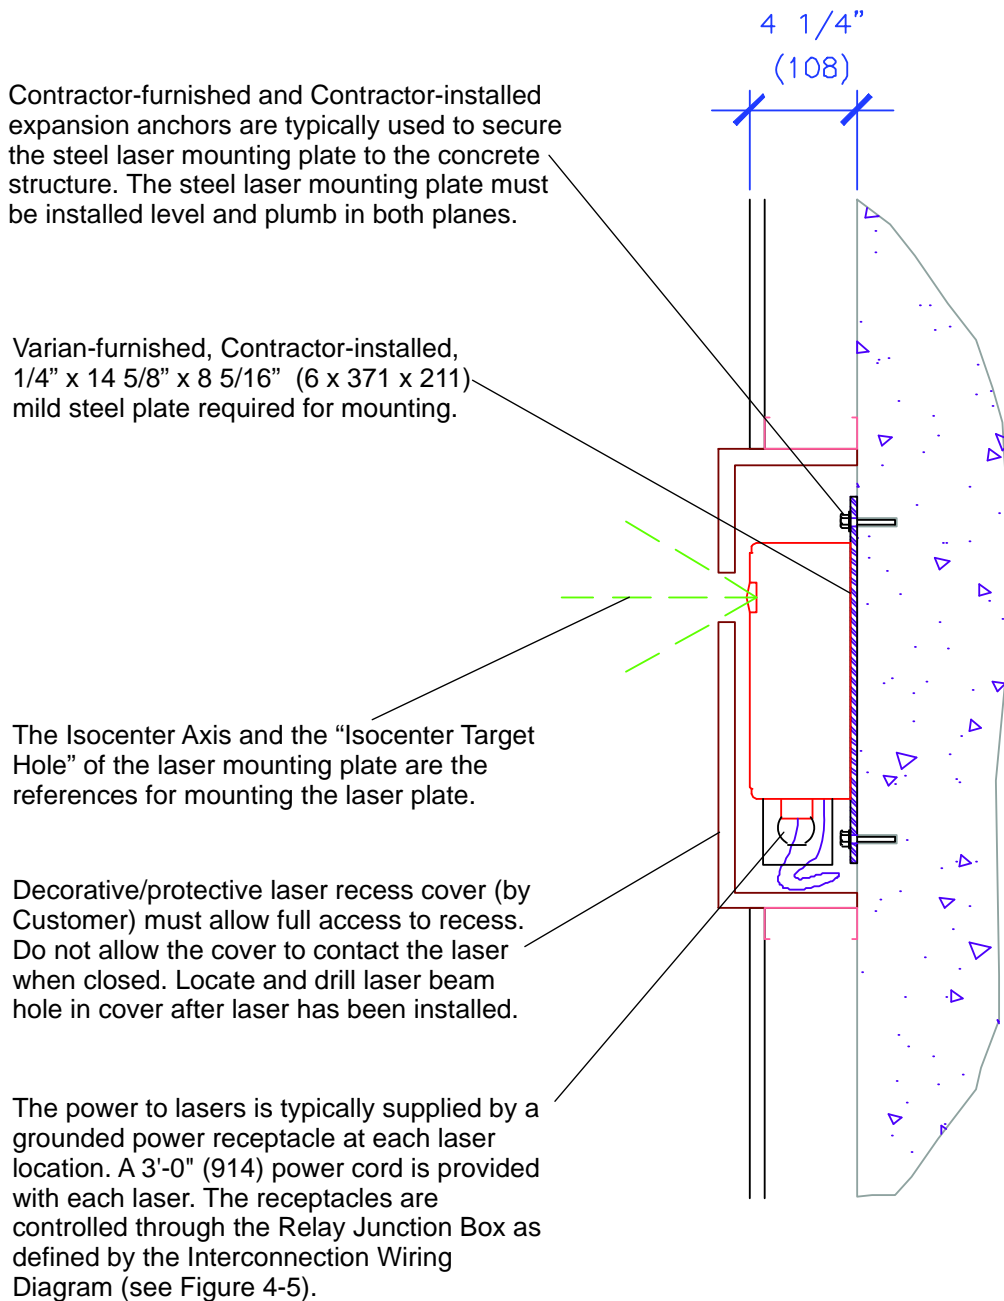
Side Laser Mounting Details (Recessed in Wall) – Elevation View
